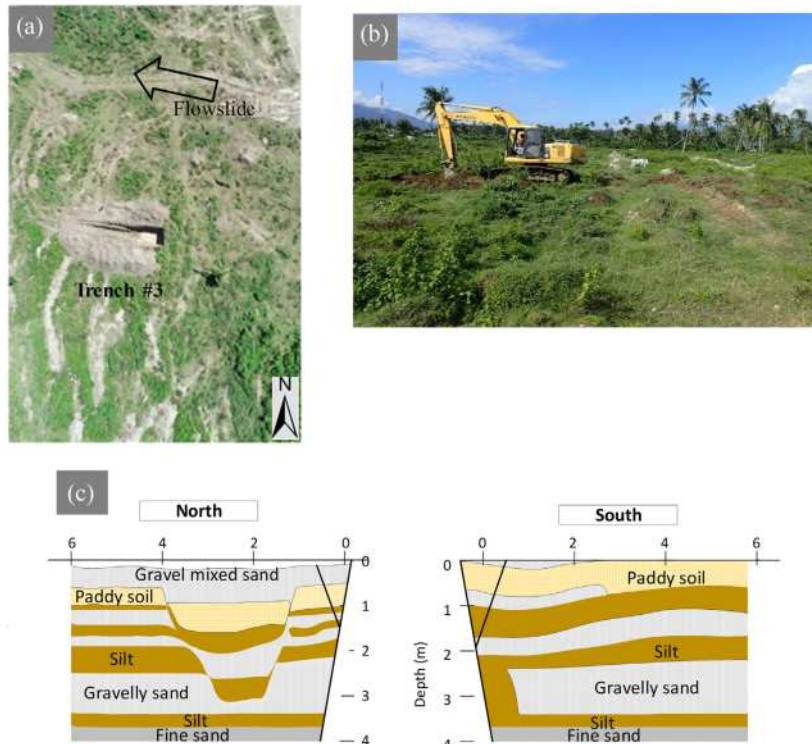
Trench #3. (a) Aerial photo (b) Site of the trench just before the excavation initiated (c) Sketches indicating stratification of soil layer exposed on the walls.
